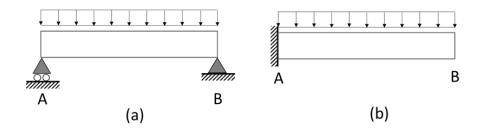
(a) Simply supported beam; (b) Cantilever beam.
